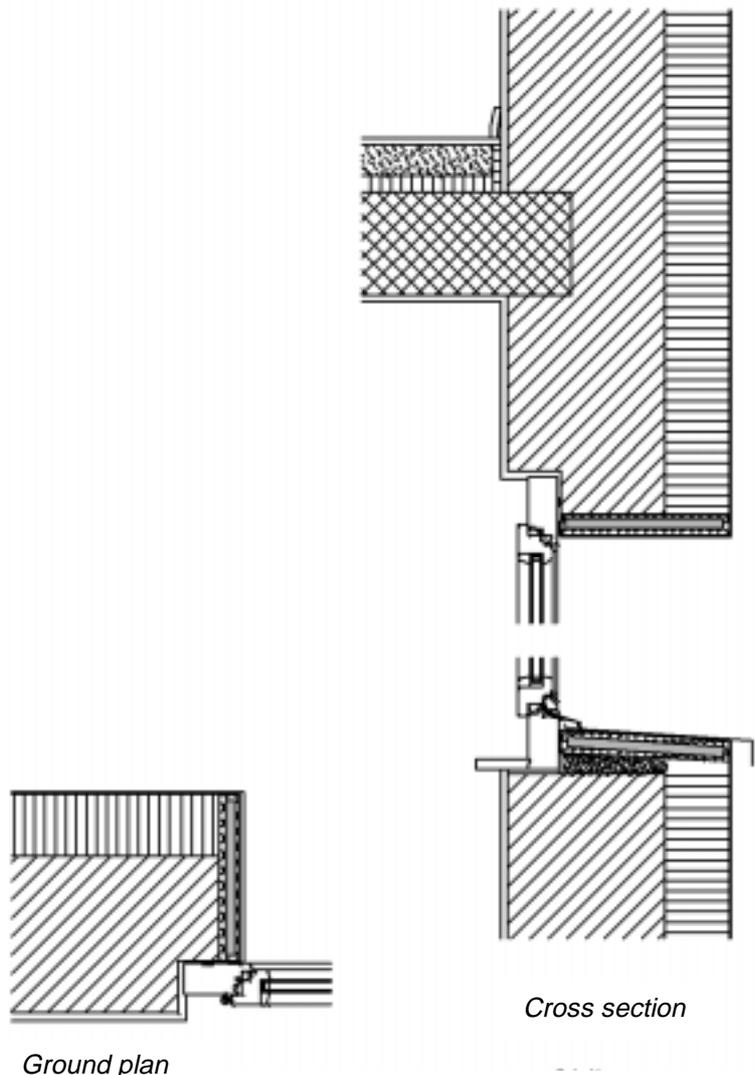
Cross section and ground plan of a feasible façade renovation. Installing VIP panels around the windows provides an ideal solution to the thermal joints problem without considerable deterioration of the interior daylight situation.
